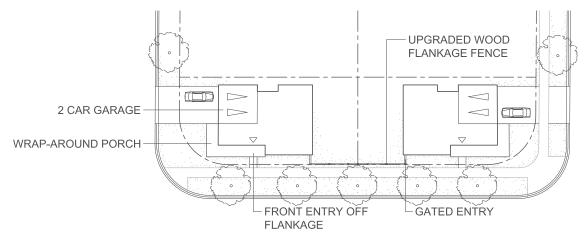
Conceptual Plan View of Dwellings Flanking the Spine Road (without Rear Extension)
